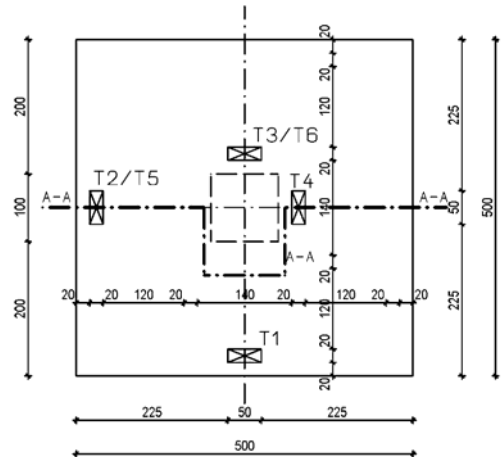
Concrete tile prepared for tensionmetrical measurement, schema of tensionmeters location
